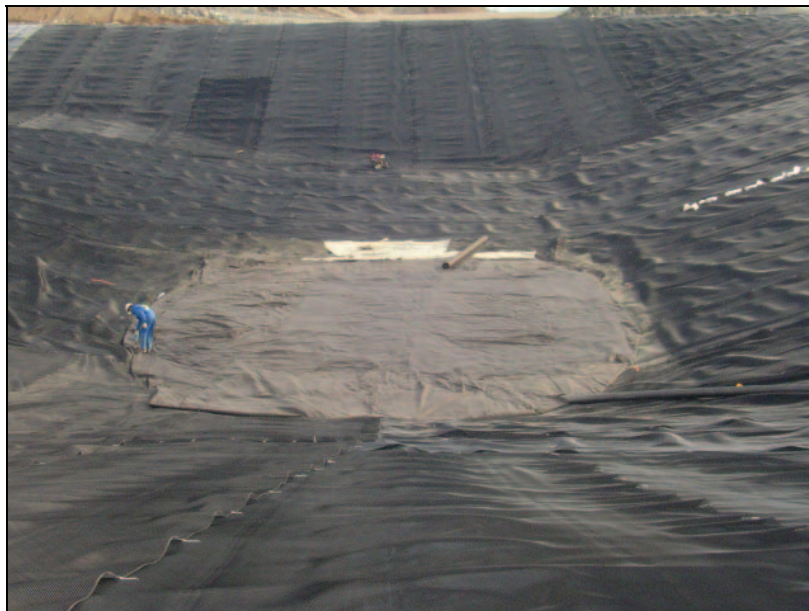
Geotextile wrapped around the LCRS drain rock
